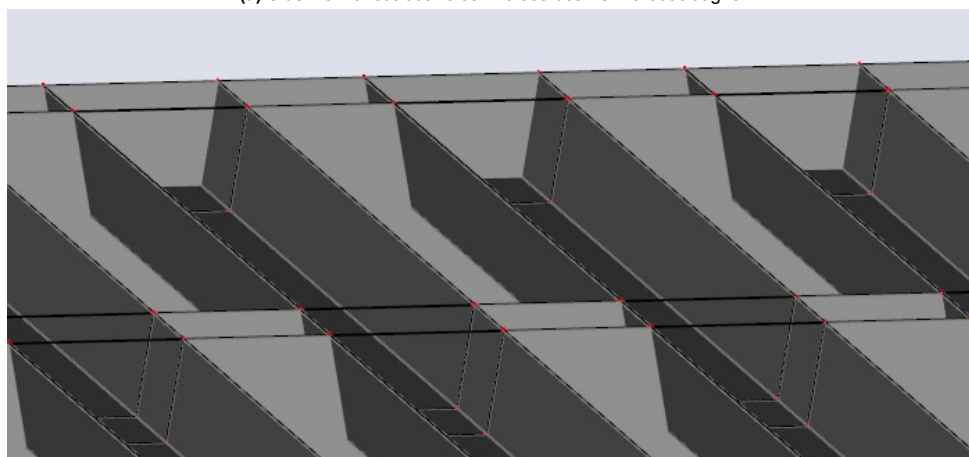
Main girder, troughs, and cross beams in SCIA Engineer.
